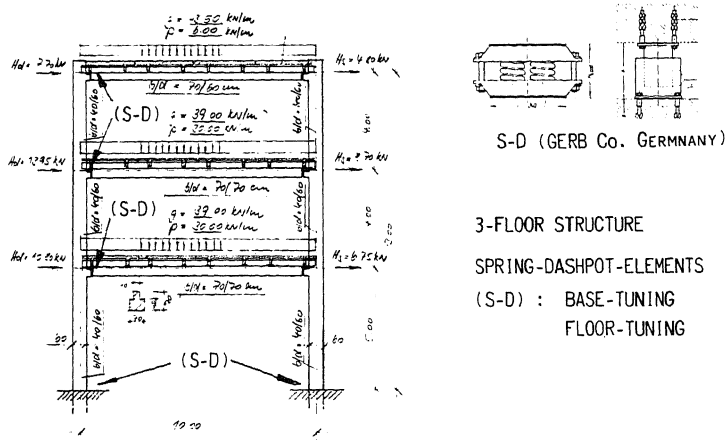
Civil engineering structure with elastic supported floors (and base)
